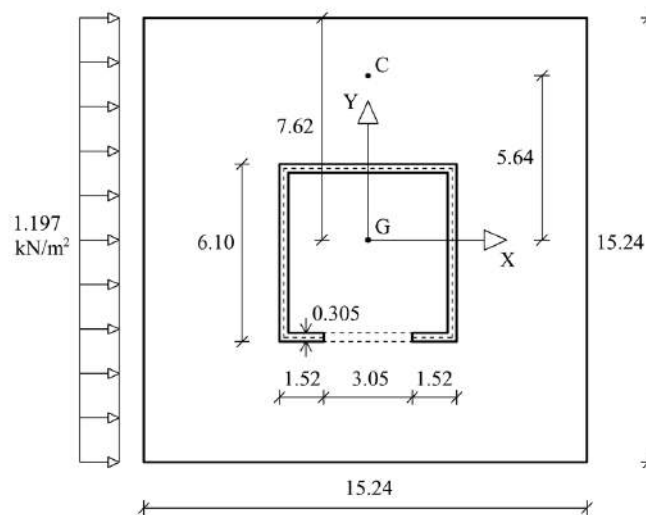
Floor plan of a 15-storey building stiffened by an internal core tube. Dimensions in metres.
